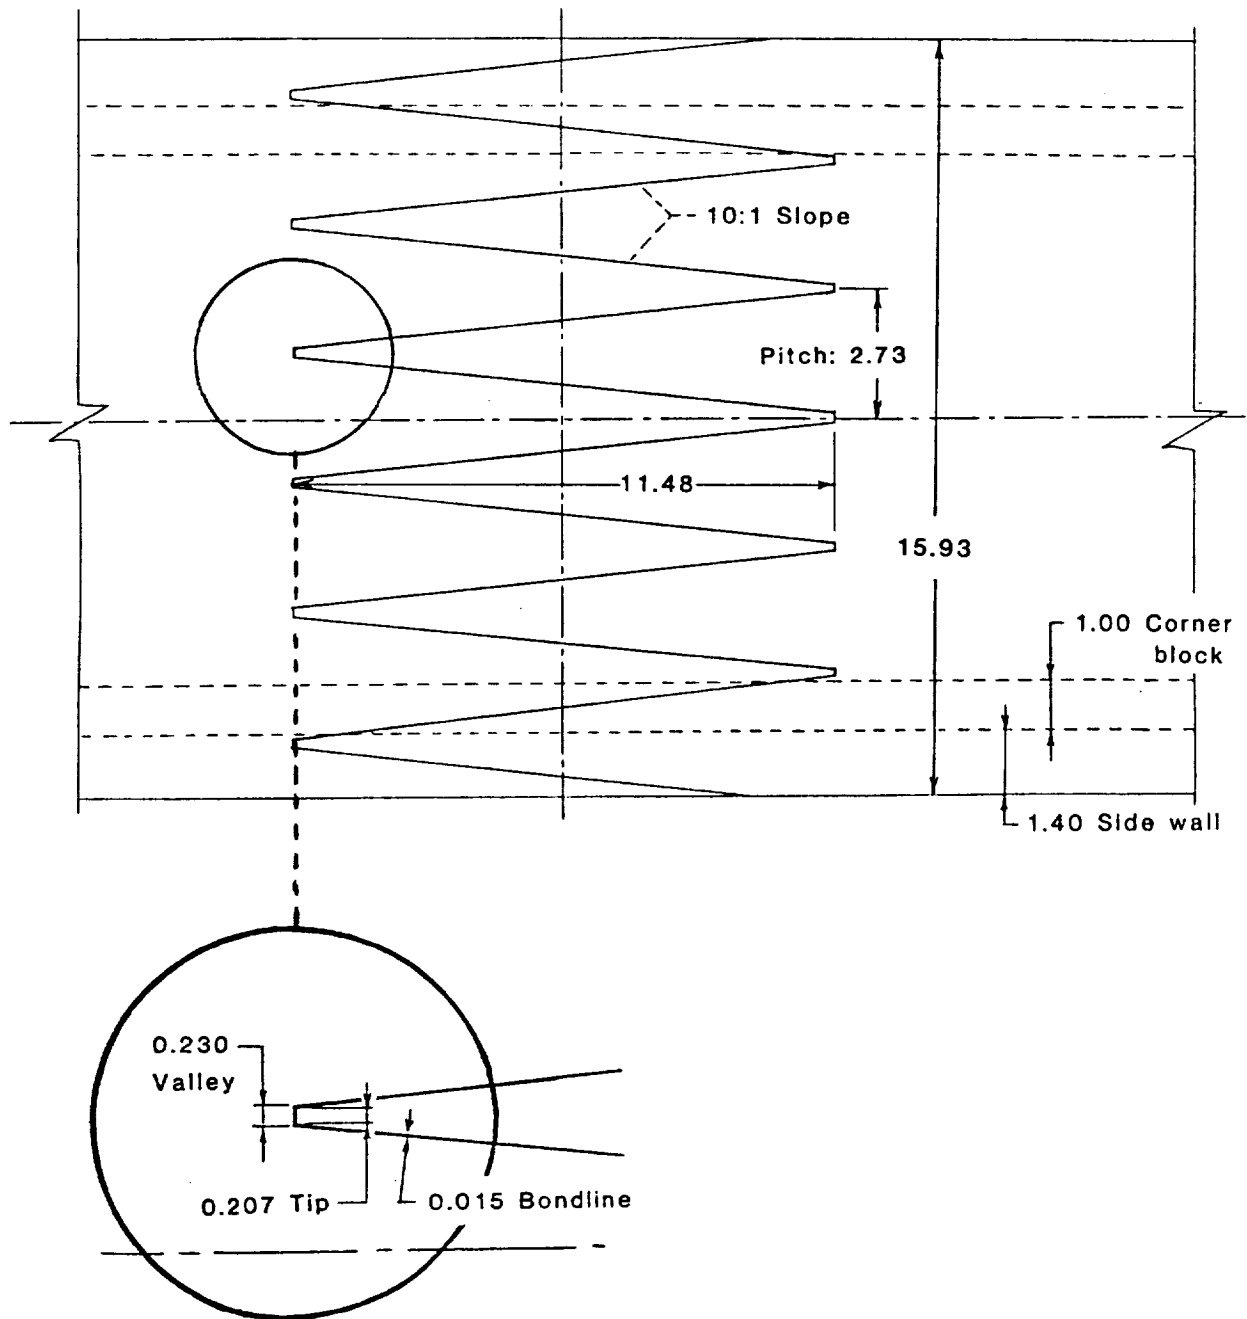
Geometry of finger joint in fatigue test beam (all dimensions in inches).
